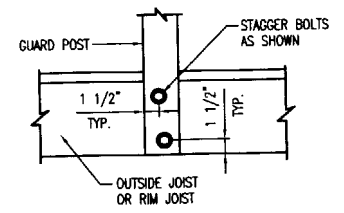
GUARD POST ATTACHMENT DETAIL
